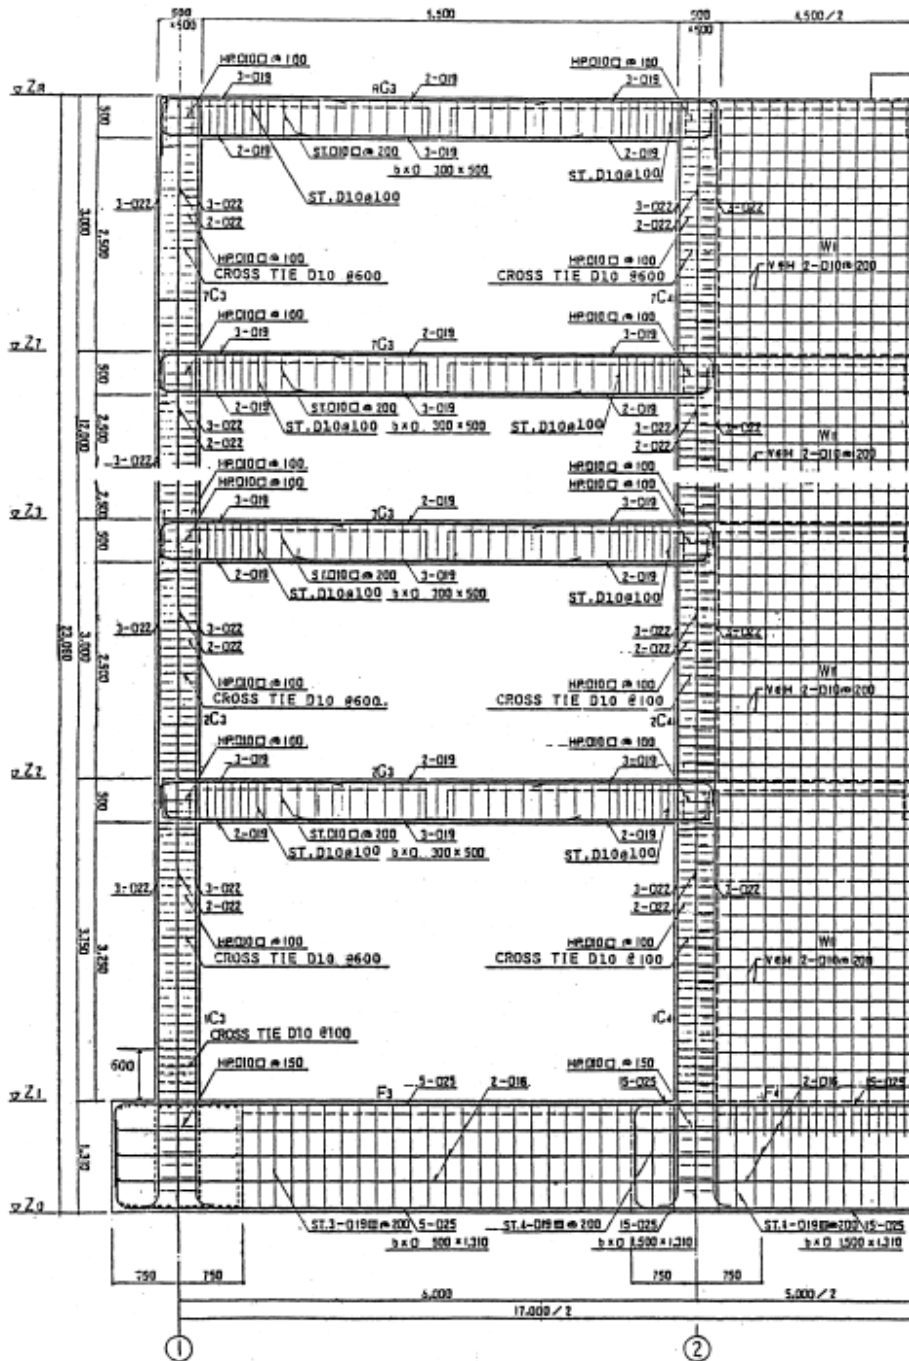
Reinforcement Details of Frame B of Full-Scale Seven-Story Test Building [12]
